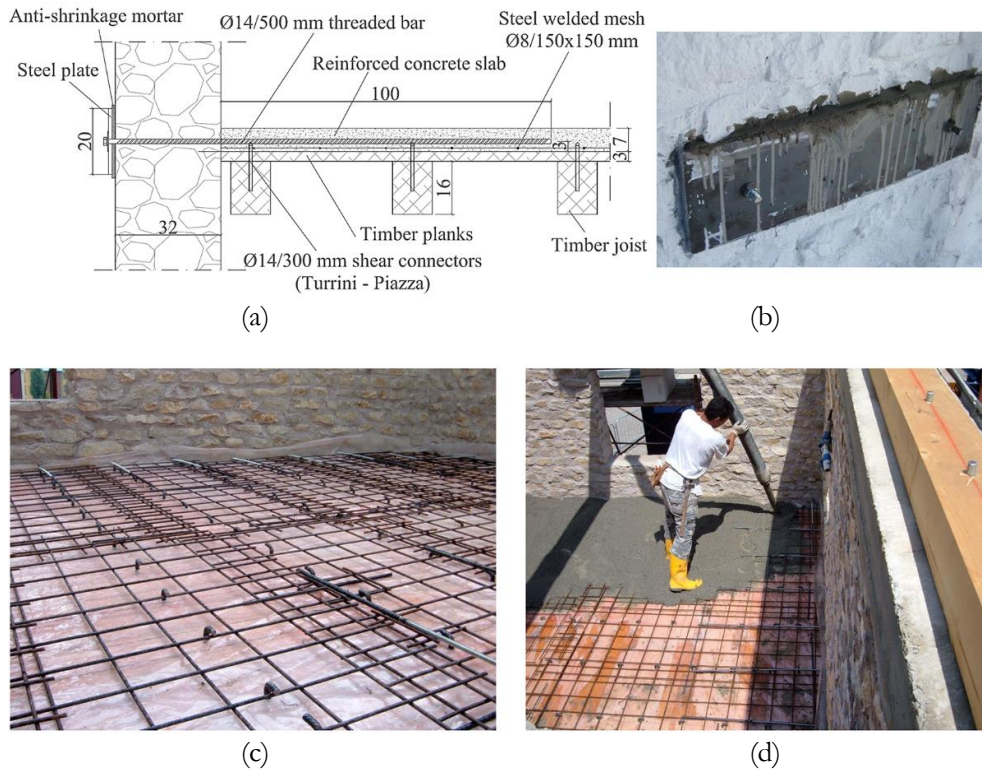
Building 3, retrofit at the first-floor level: (a) structural detail of the wall-to-diaphragm connection and of the RC slab; (b) external steel plates; (c) shear connectors, steel welded mesh and threaded bars for the wall-to-diaphragm connection; (d) lightweight RC slab casting. Units of *cm*.
